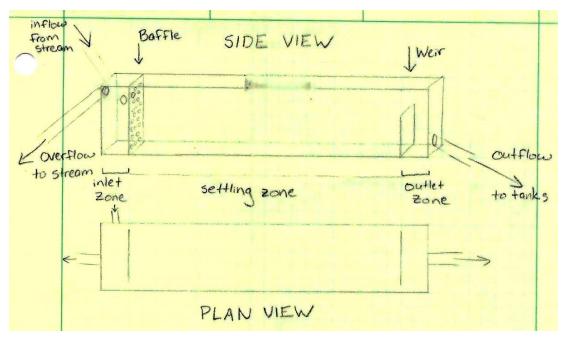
Sketch of the Cistern Design including inlet zone, settling zone, and outlet zone.
